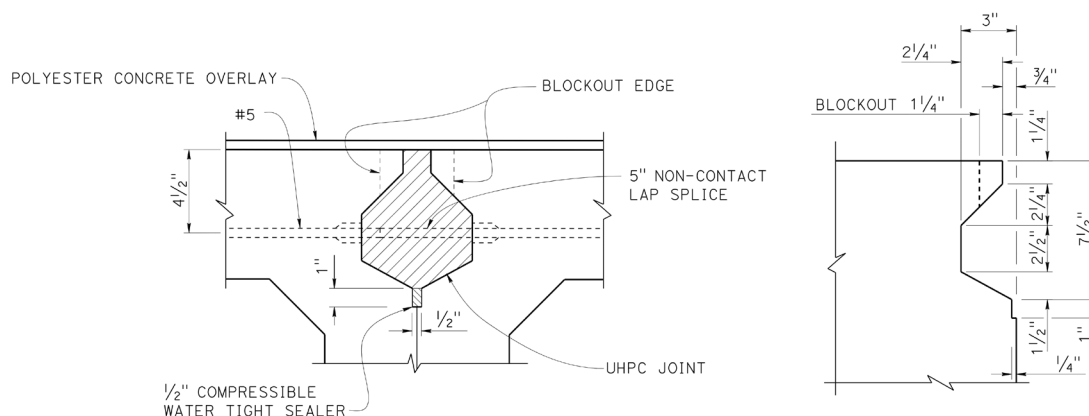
Longitudinal Keyway Detail with UHPC Connection from the 21st Avenue UC (Replace), Contract No. 03-0H3424
